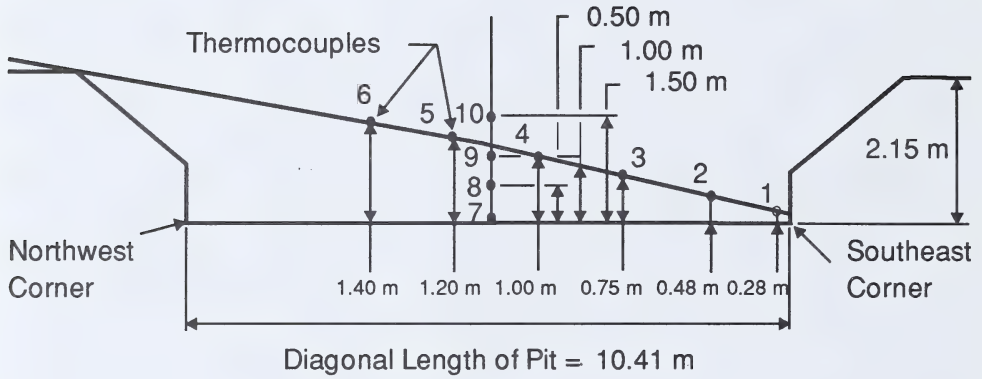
Installation of thermocouples in the east pit (diagonal cross-section).
